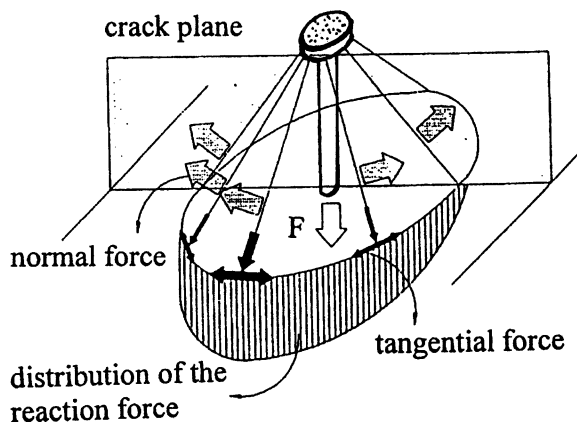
Load-transfer mechanism of headed anchors in cracked concrete¹⁸
